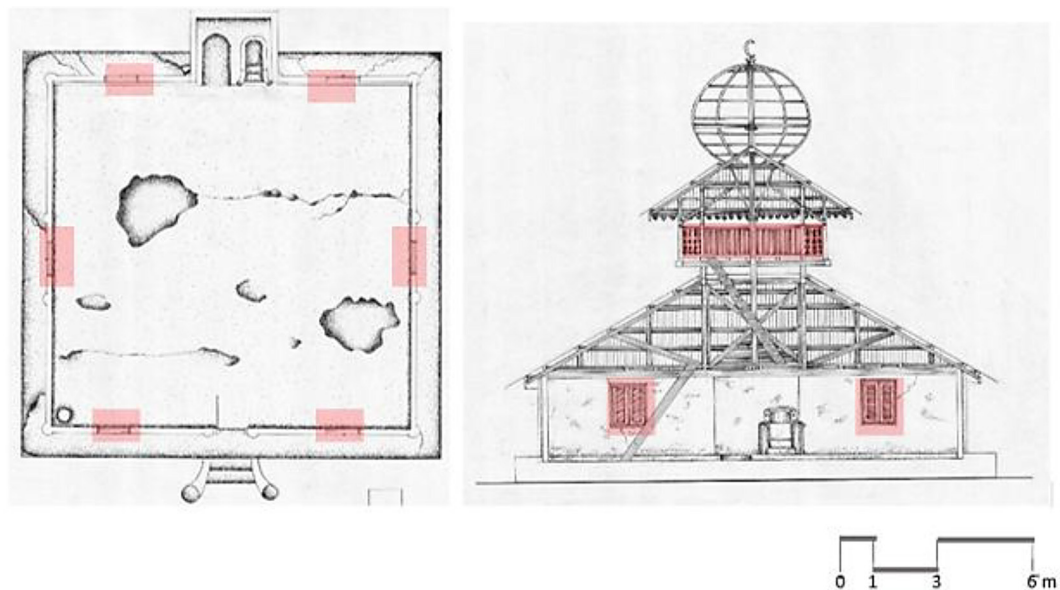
(M2) Tue Kebayakan mosque (floor plan, vertical section, and ventilation shown in pink)
